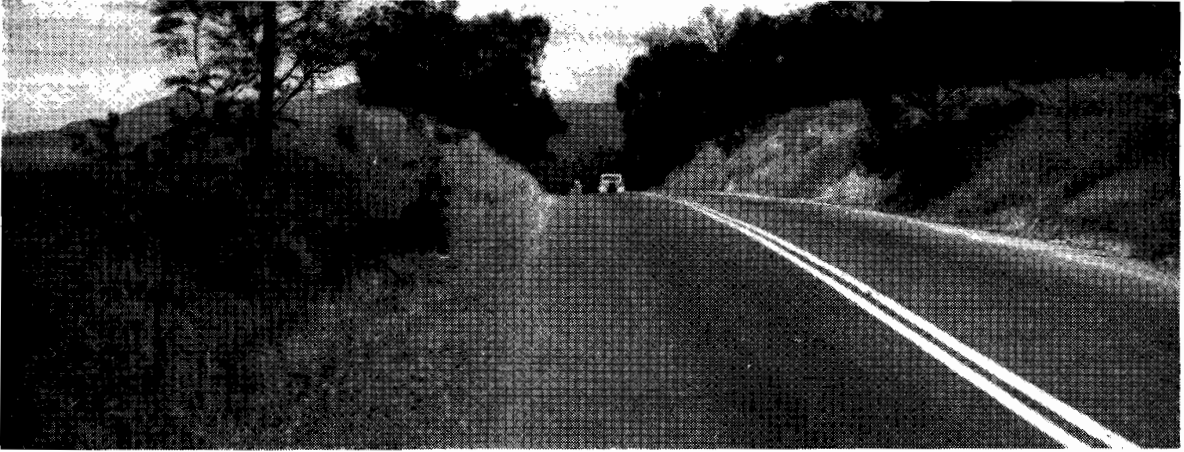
Maroondah Highway, approximately 35 miles, showing section before reconstruction at a sharp vertical curve.
